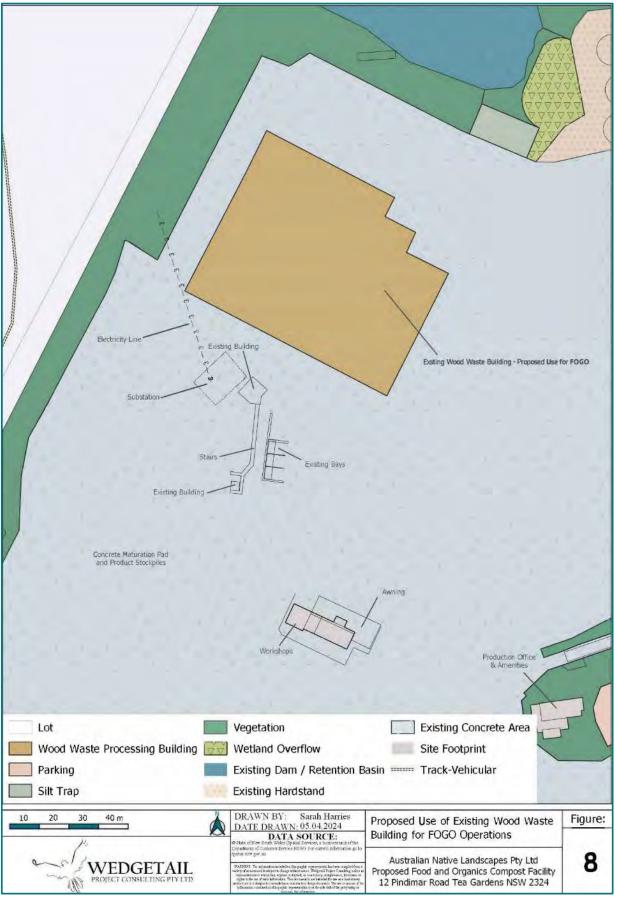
Existing Wood Waste Building to be utilised to Receive and Compost FOGO
